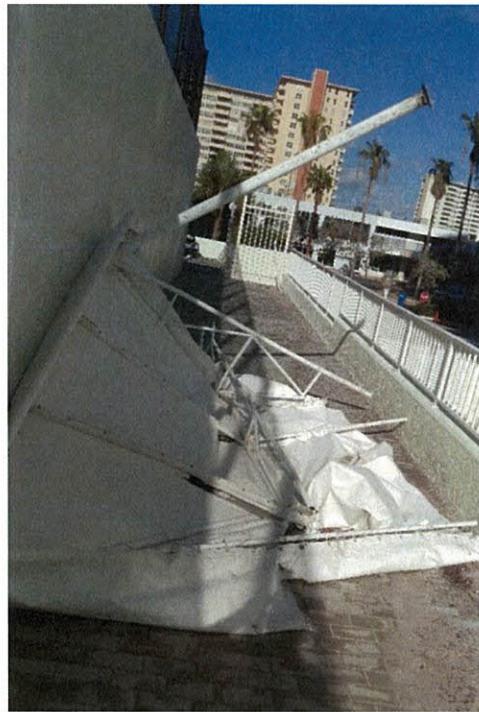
Blown out metal frame from failed base connections caused by Irma's wind pressures (adjacent to tennis court at north tower).
